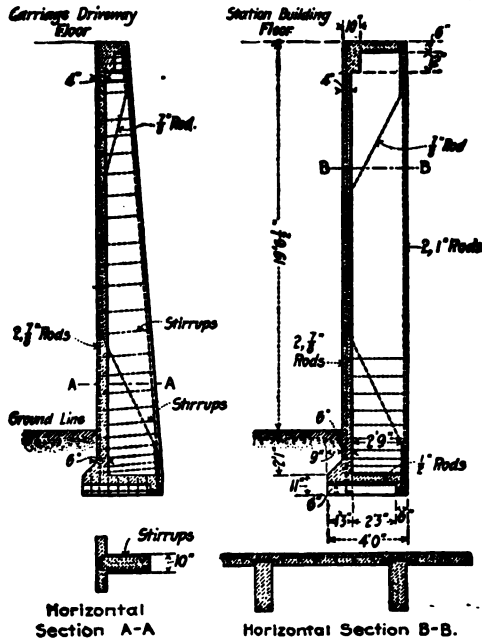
Retaining Wall, Brooklyn Grade Crossing Commission.
